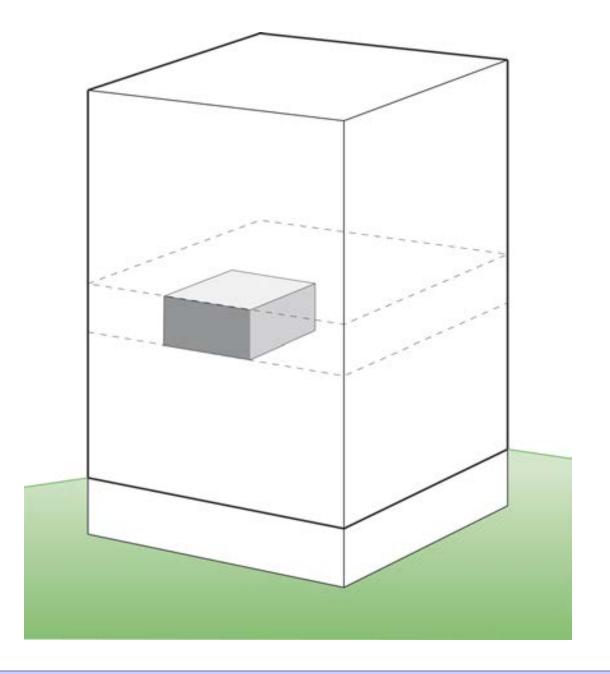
Apartment building with tighter apartment entry doors (Adapted from G.O. Handegord, 1998)
